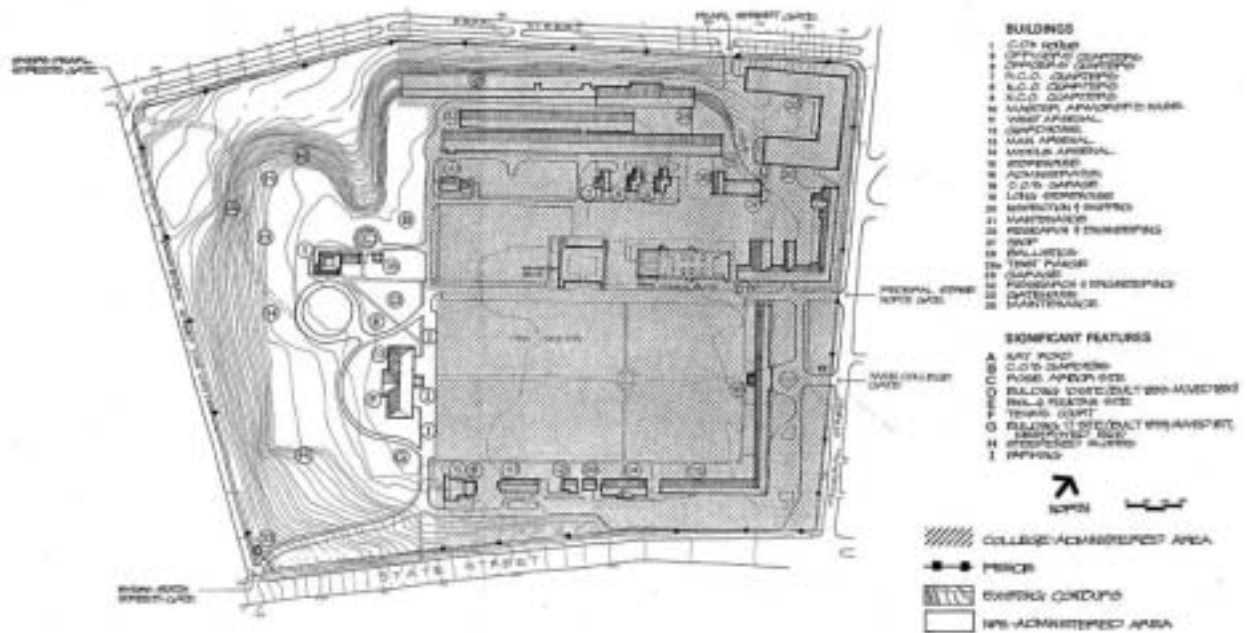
Plan of 1986 existing conditions prepared for Springfield Armory General Management Plan/Development Concept Plan by NPS and STCC.
